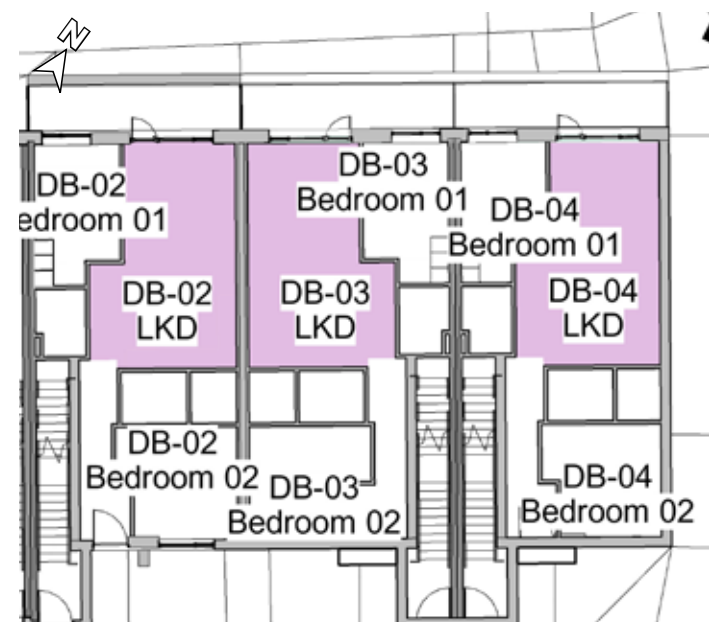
Duplex B Ground Floor: highlighted rooms below the minimum recommendations for SDA.
